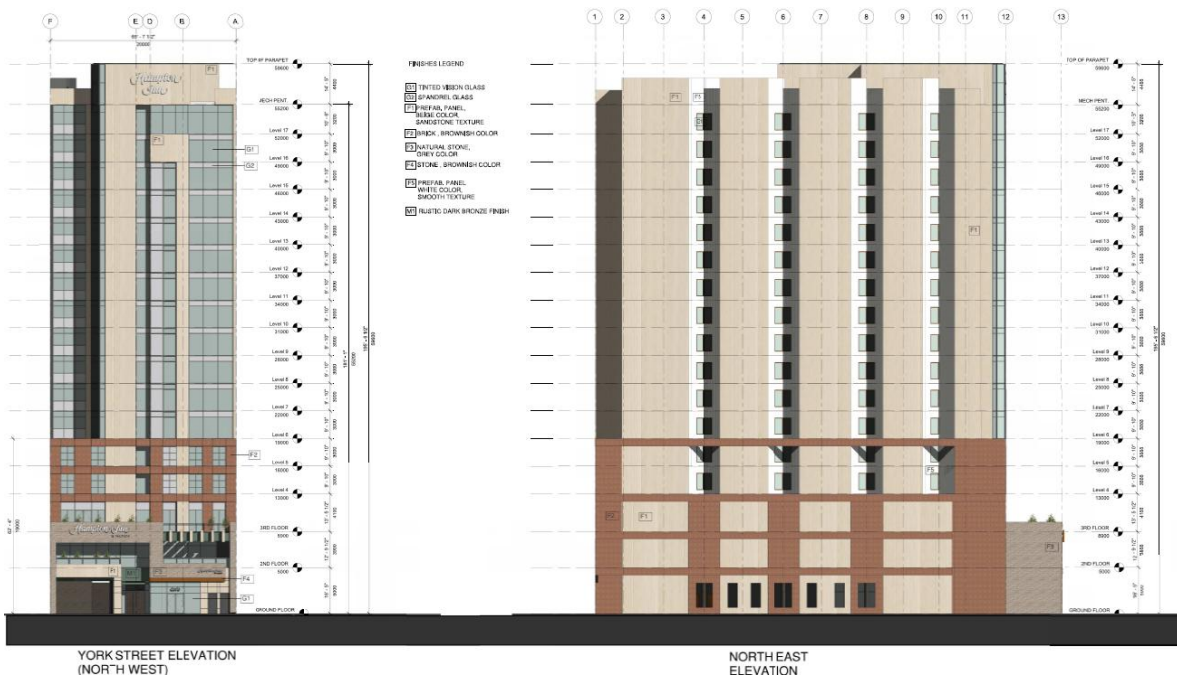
Elevation drawings for the front (York Street) and northeast side elevations. Source: *Design Brief*, 6 July 2018, 6 July 2018.
